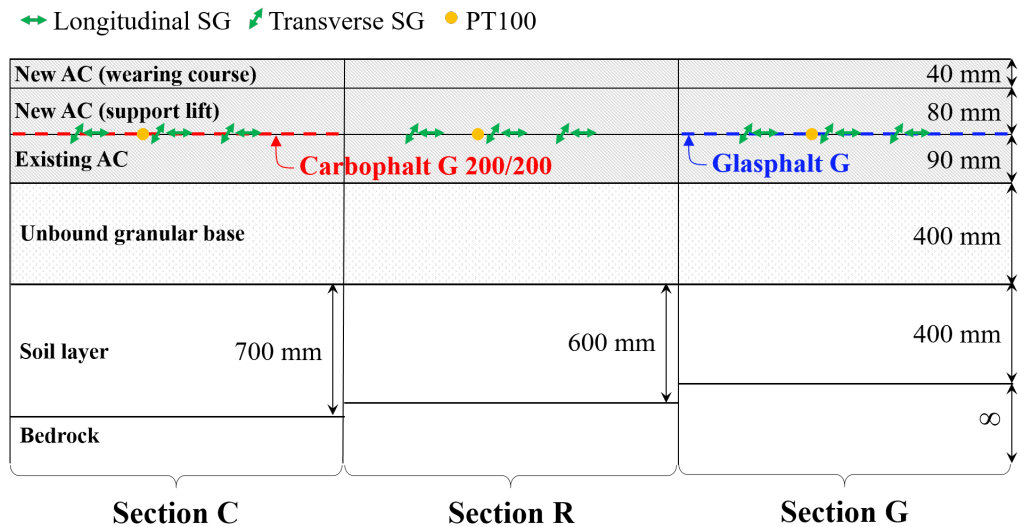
Cross-sectional view of the three instrumented sections in La Ferrière.
